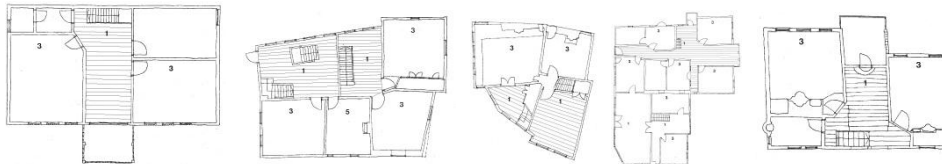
Plans of a houses floor with a different form of chardak, Tetovo, Veles, Ohrid, Berovo and Kratovo
